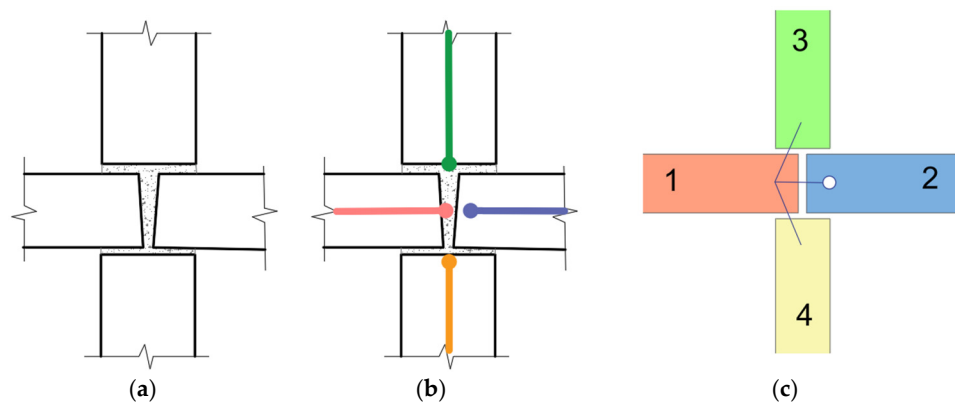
Horizontal joint configuration and geometry: (a) geometry of the precast RC wall-panel joint; (b) load-transfer directions for joint type FE59; (c) conceptual model of the four-panel joint [41].
